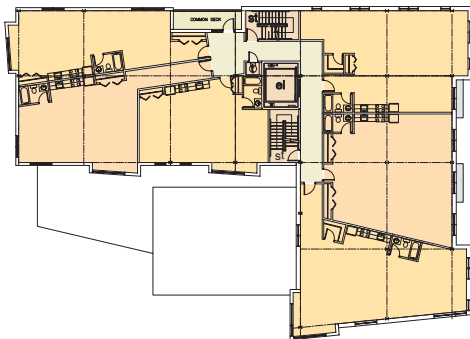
Typical upper floor plan, ARTBLOCK East. (ICON architecture)
